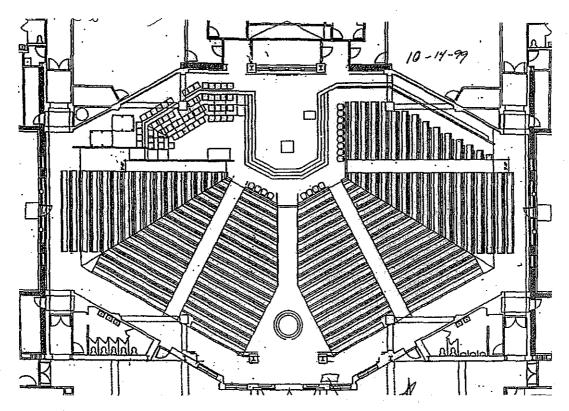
Sanctuary plan for the Church of St. Peter, by the office of Bentz, Thompson, and Rietow Architects. One enters at the bottom of the plan, around the baptismal font, and toward the altar. The seating plan directs all attention toward the center, while at the same time toward other members of the congregation, ultimately enhancing one's sense of community. The plan is also indicative of sending on missions because upon leaving, it guides the congregation toward doors that lead in numerous directions.
